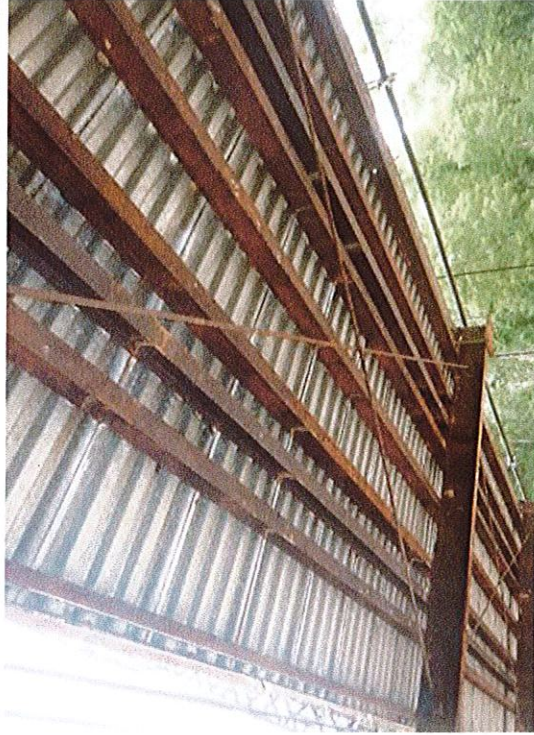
SPAN 4: Typical flooring system (9 stringers typical)
